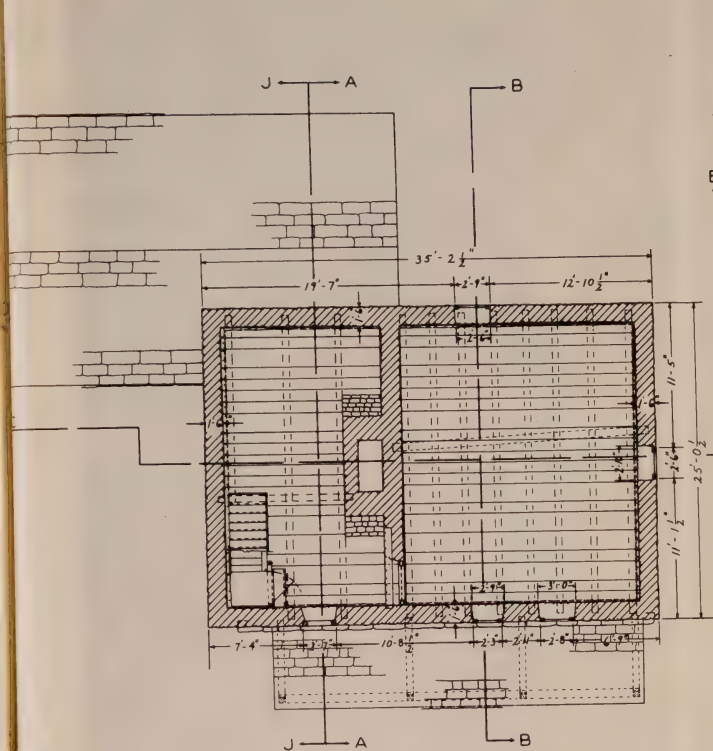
# PLATE IX TROXELL 1744 HOUSE FLOOR PLANS
